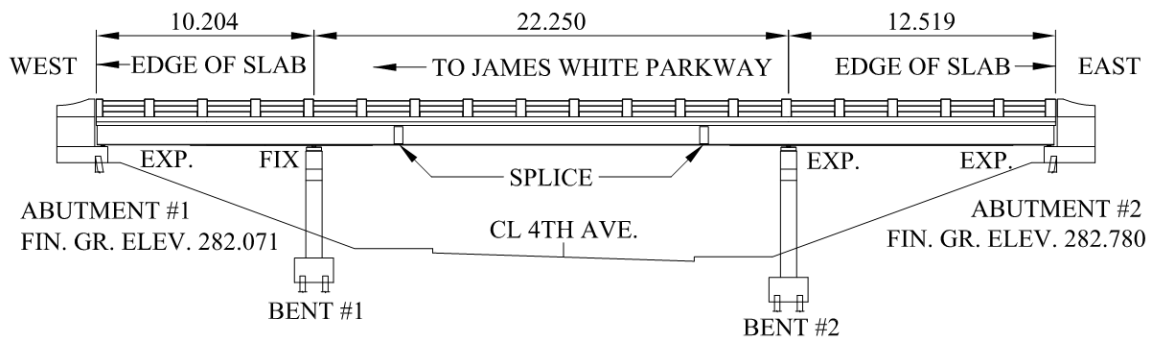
Entrance ramp to James White Parkway: elevation (m)
